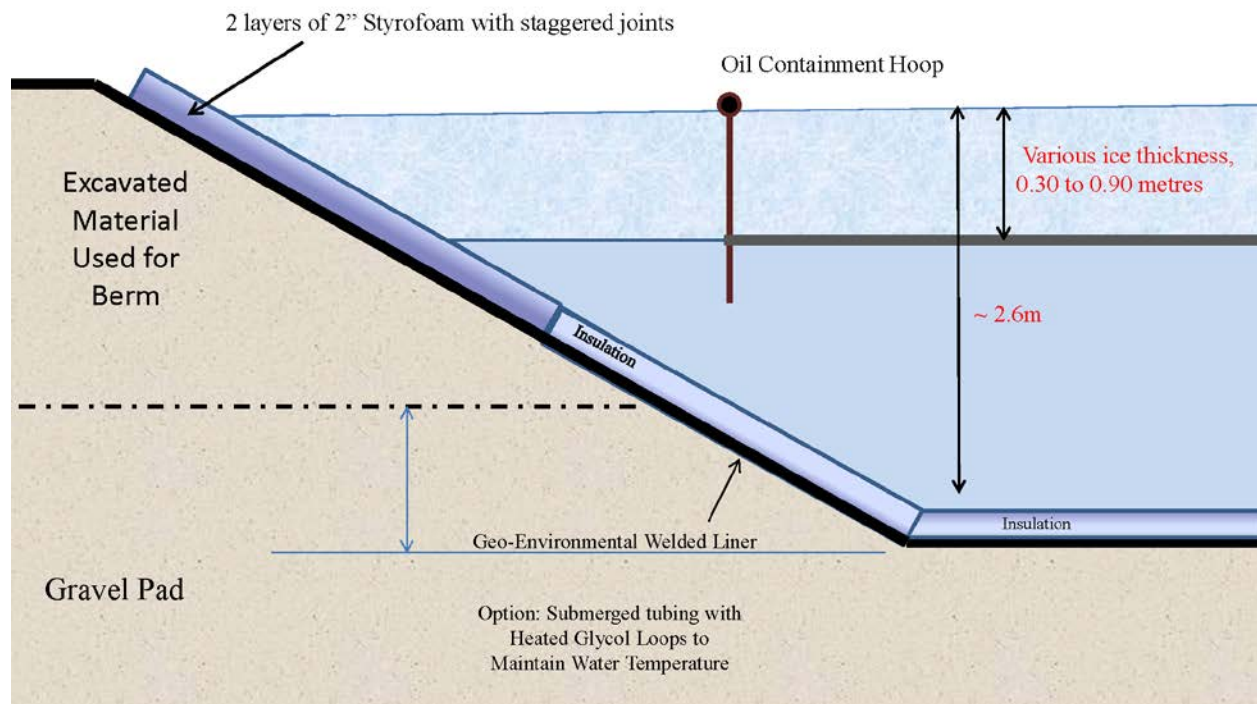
Preliminary Test Facility Schematic (Schematic 1)
